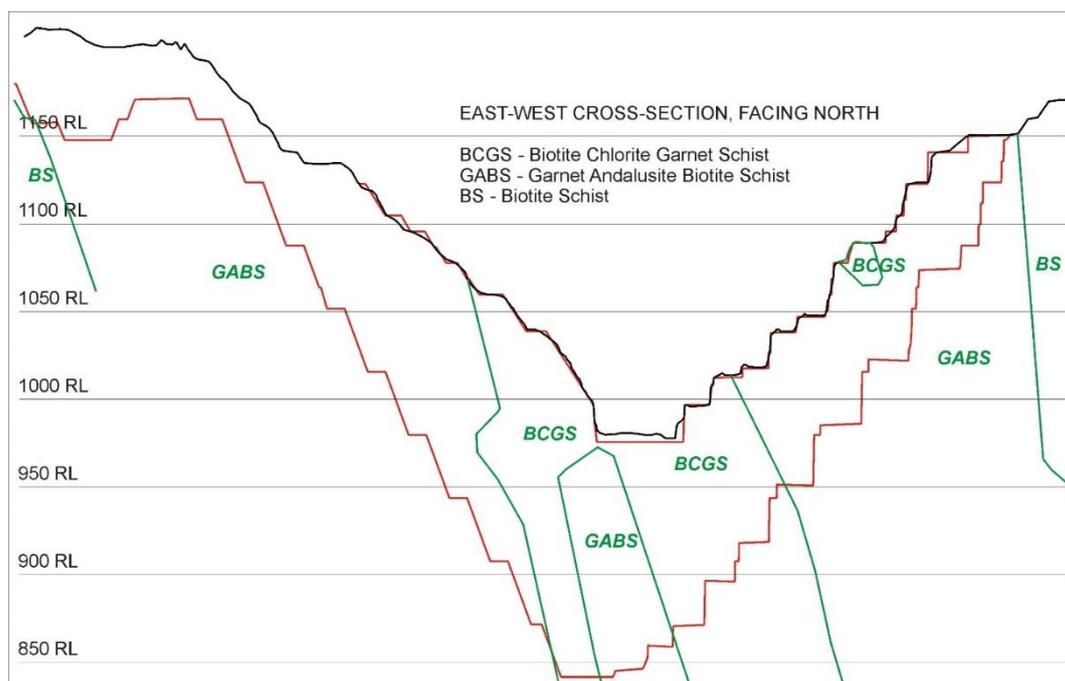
Cross-section through existing Kavanagh Pit and proposed Giant Pit design, and geology
